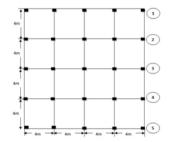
MODEL OF BUILDING WITHOUT SHEAR WALL
